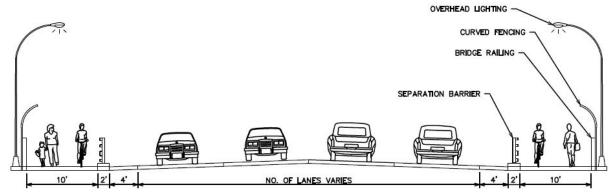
Typical Section of Separation Barrier Added to Existing Crossing
